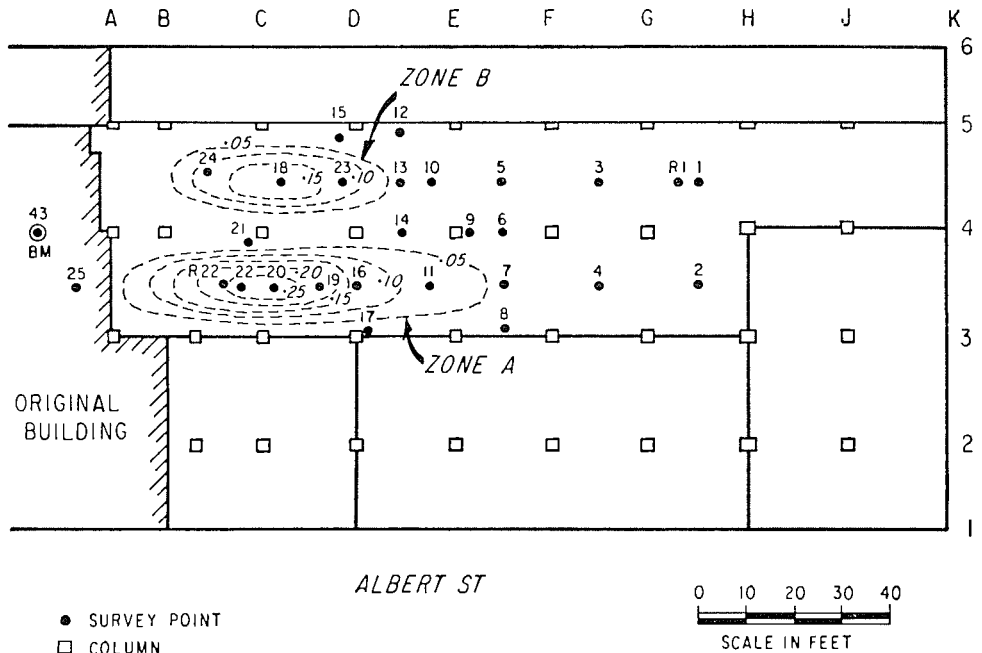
Plan of extension to Bell Canada building showing contours of heave in feet of basement floor slab.
